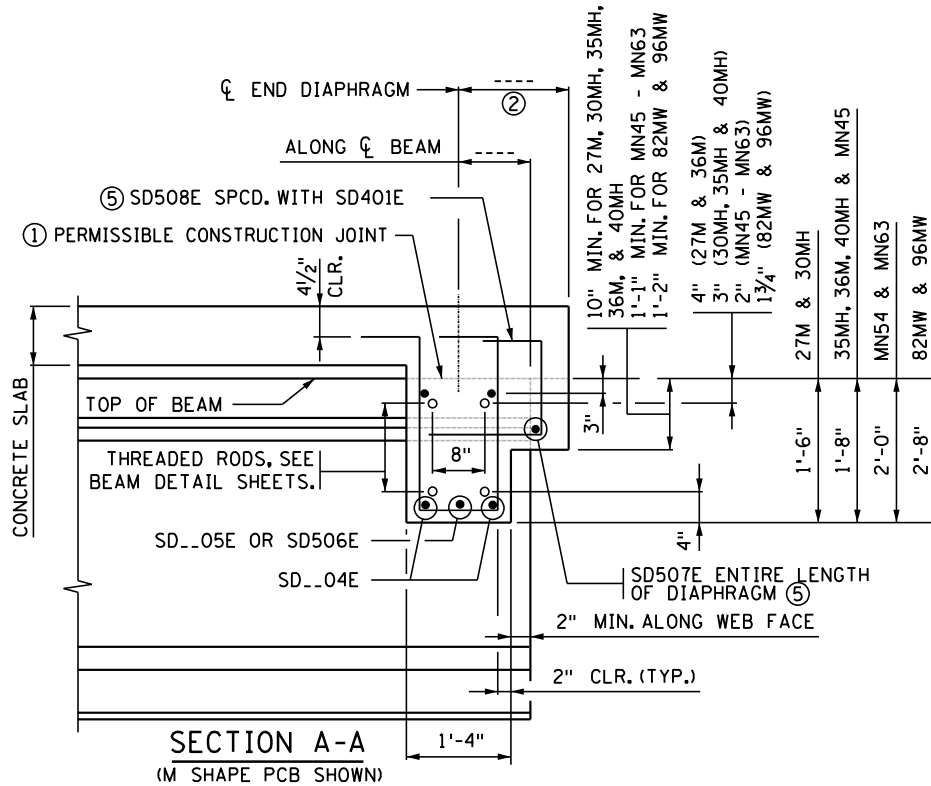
Standard MnDOT detail B814 Concrete End Diaphragm – Parapet Abutment
